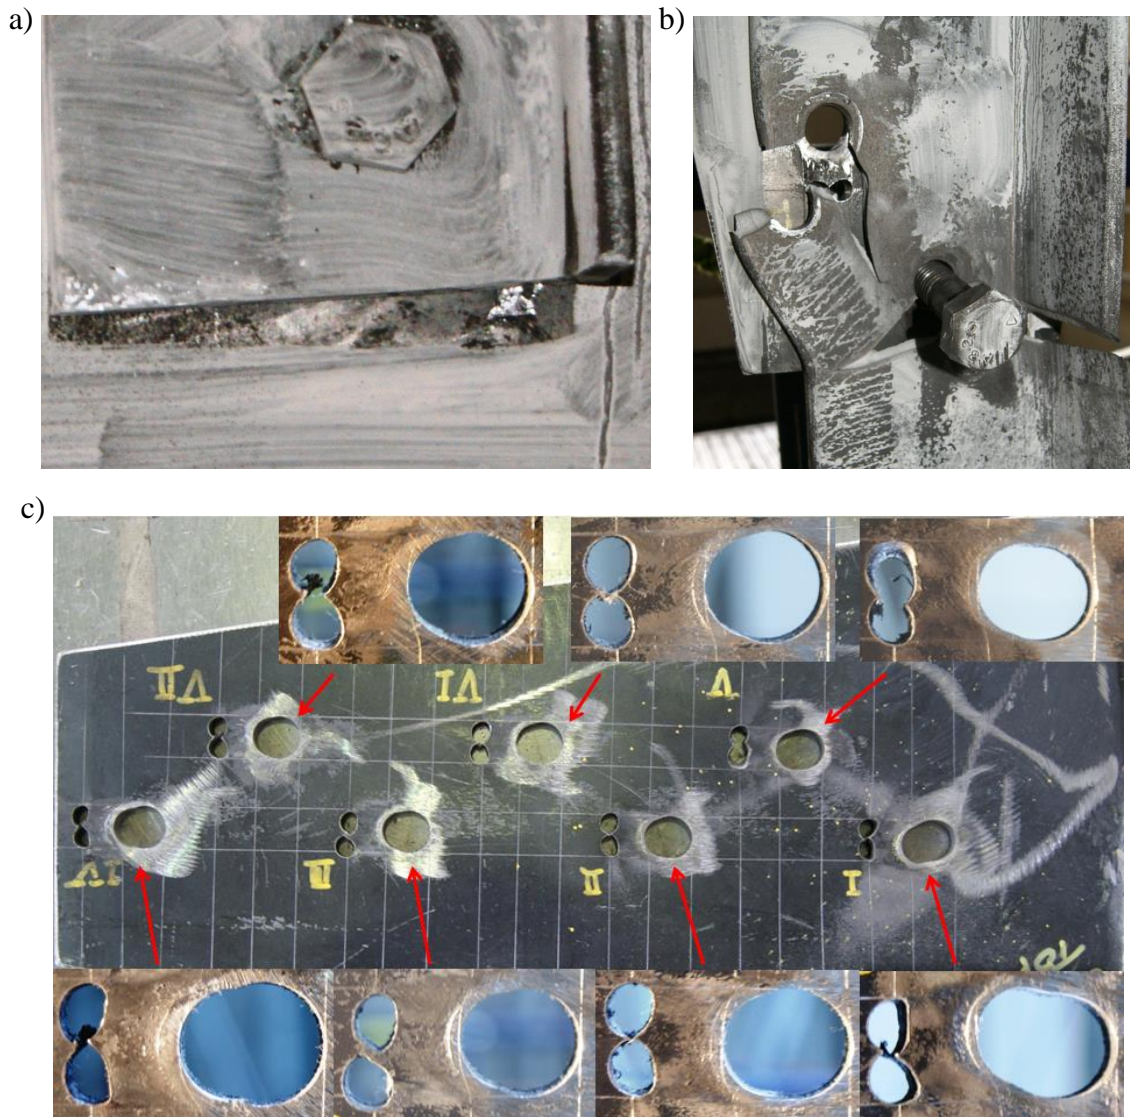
Specimen No. 4 - Observed damage after the test: a) relative displacement between the brace and the gusset plate; b) fracture plane; c) & d) local inelastic deformations near the bolt holes in the top (c) and bottom (d) gusset plates
